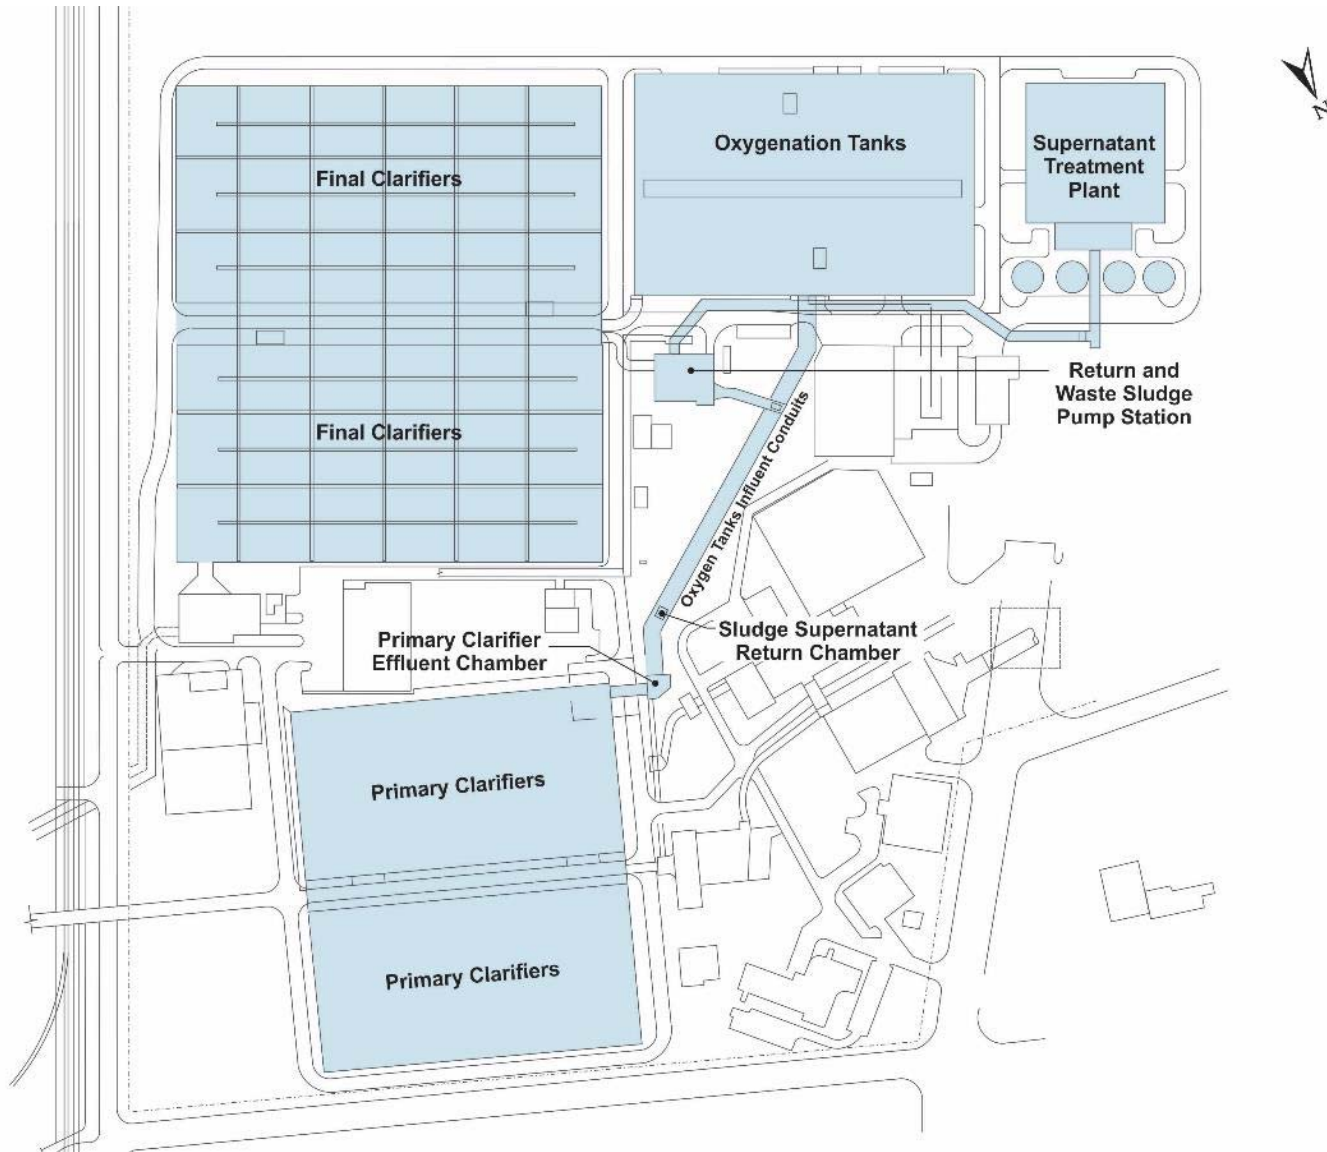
PVSC Site Plan and Treatment Facilities – Liquid Treatment
